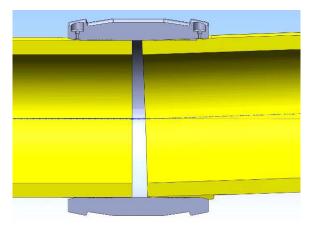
Mis-cut Unacceptable – Possible Cause: Failure to cut Pipe End Perpendicular to the Axis of the Pipe
